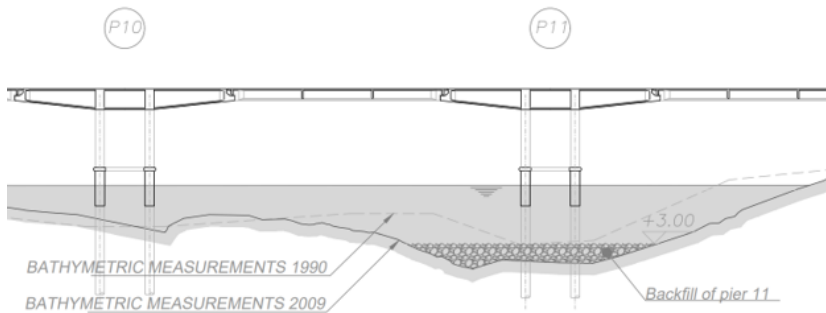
Longitudinal section of Piers 10 and 11. Dimensions in metres.
